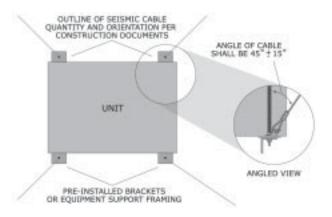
Plan view of vibration isolation suspended attachment to the building structure.
